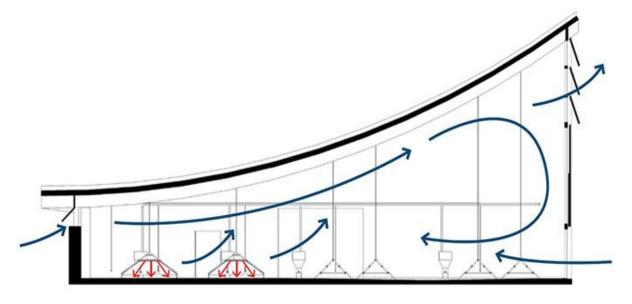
Cross section of Windstreek House. Photo: VDL Agrotech.
